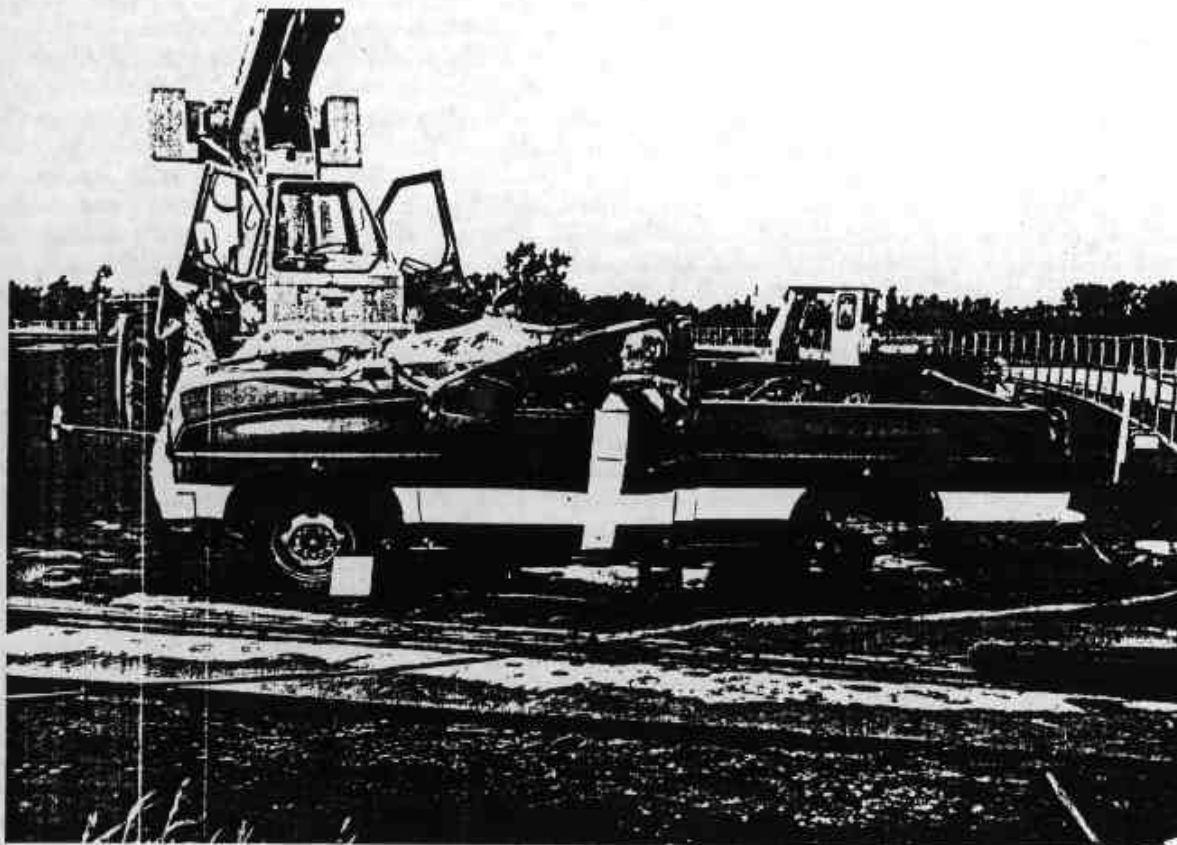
POST-TEST LEFT SIDE - VIEW 2
